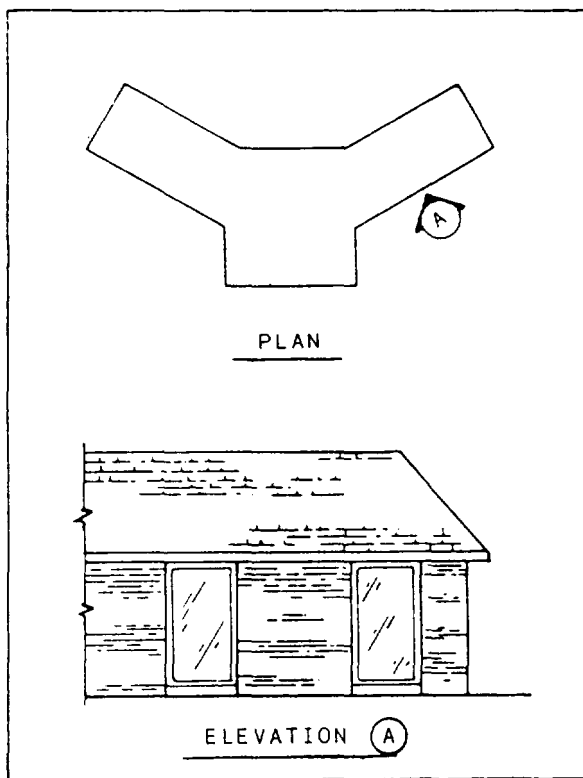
Use of a letter to identify elevation on irregular floor plans.
